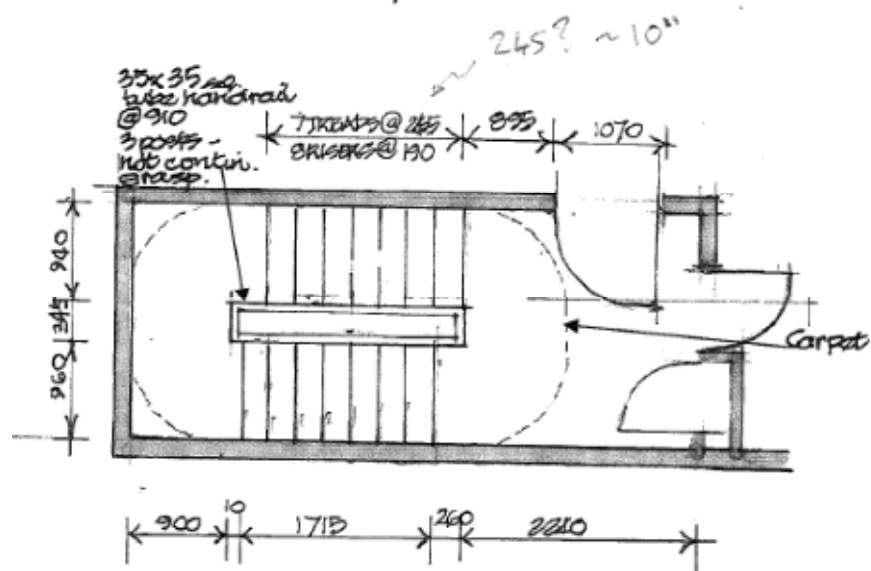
Manchester “Clean Stair” Plan (MacLennan, 2011)
